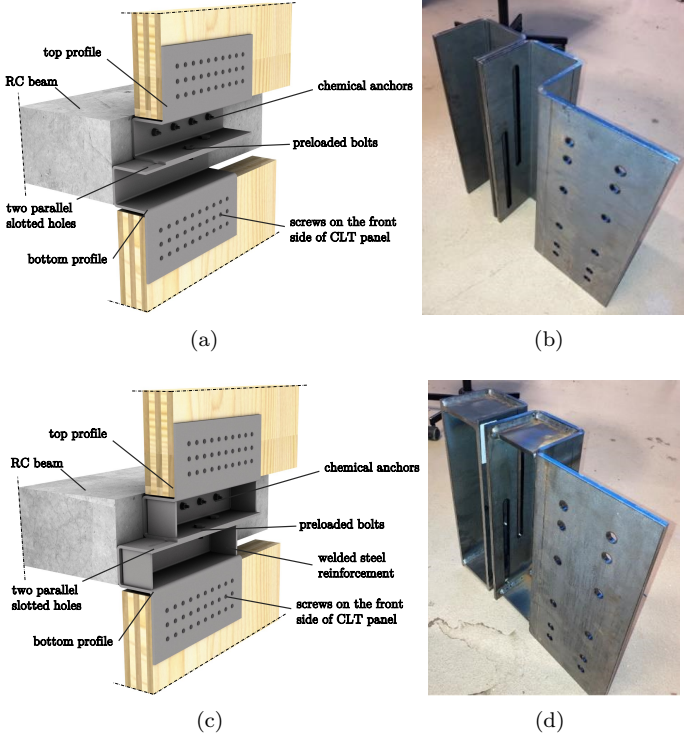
(a) STD prototype; (b) STD specimen; (c) STD-R prototype; (d) STD-R specimen.
